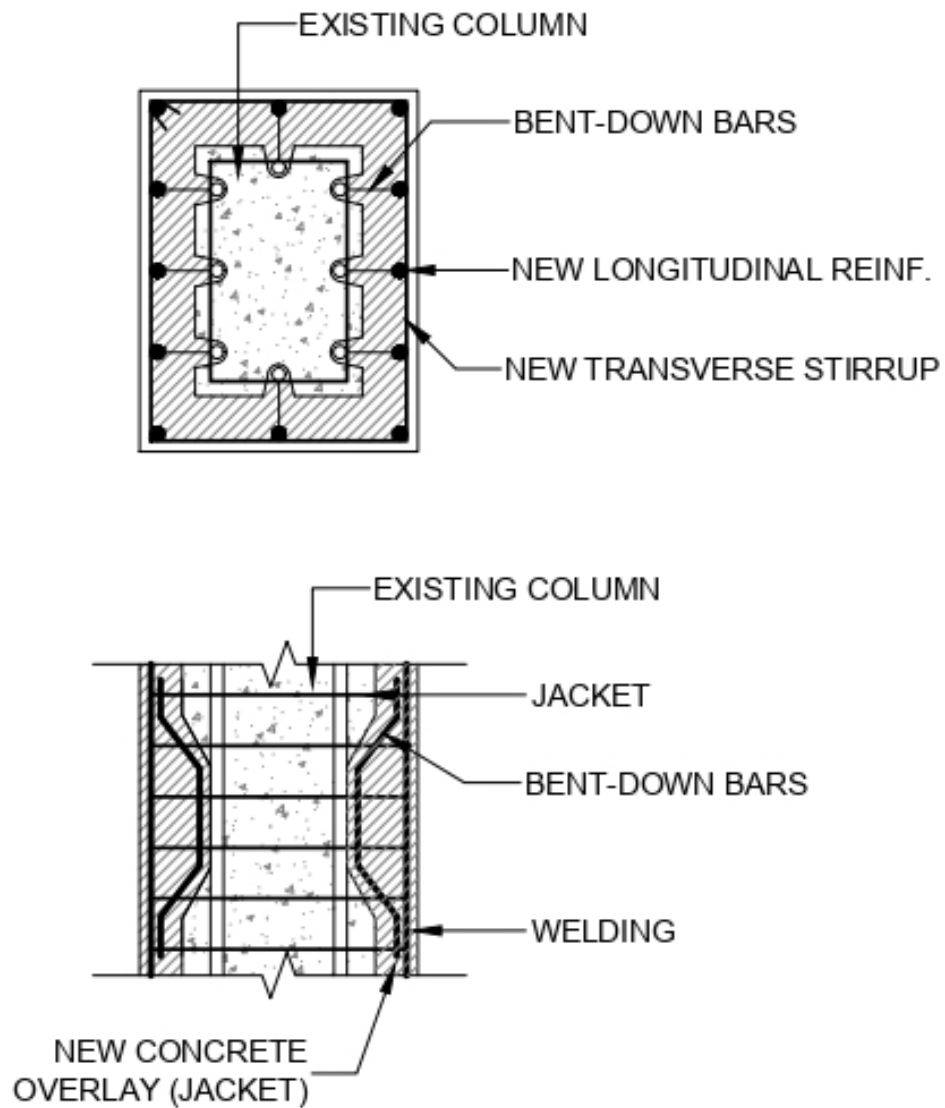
Typical Jacketing Detail (Ref. IS 15988:2013)
